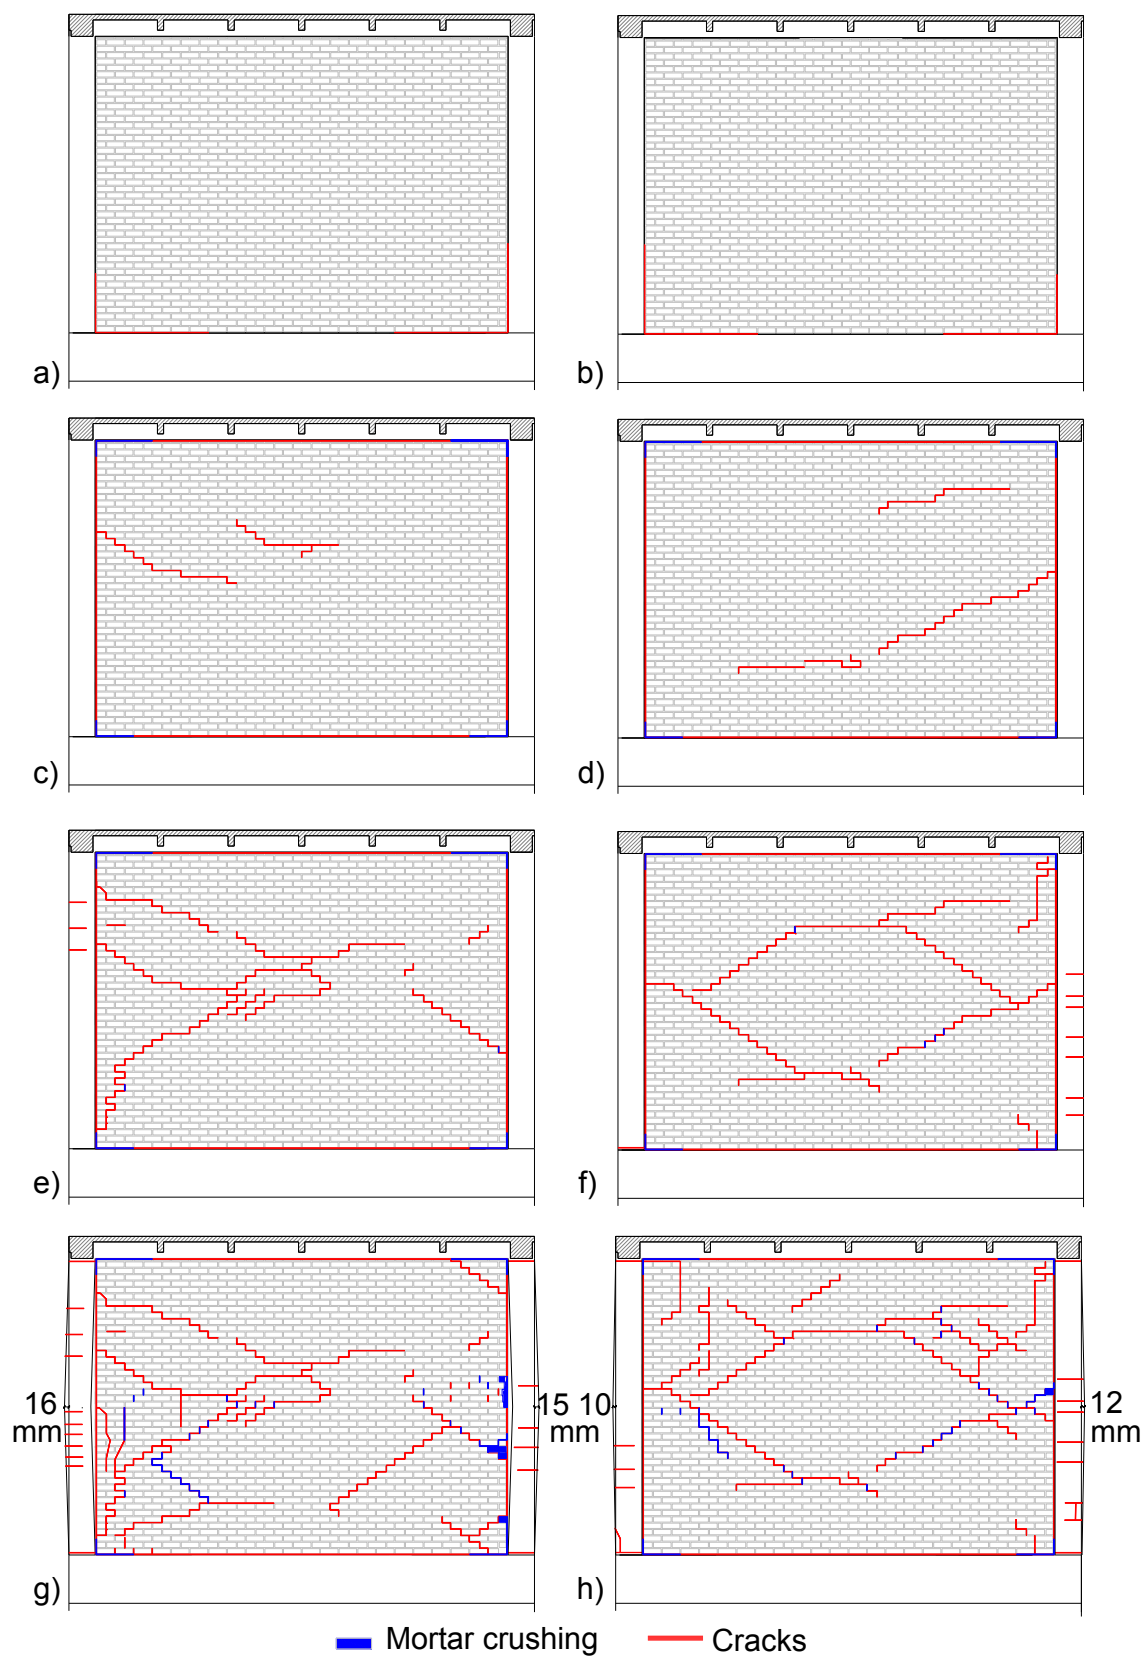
Crack pattern on wall 1 (left column) and wall 2 (right column) at the end of each seismic simulation: (a, b) C100; (c, d) C100B; (e, f) C200; (g, h) C250.
